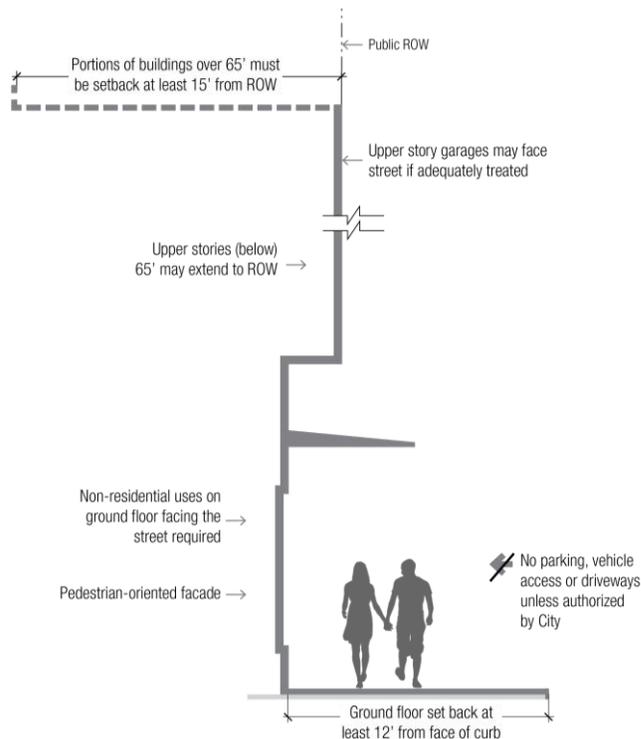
C.1: Summary of requirements for building façades facing a Type A Pedestrian Oriented Street. (This diagram is for illustrative purposes only. See OMC 18.120.220.C for stated requirements.)
